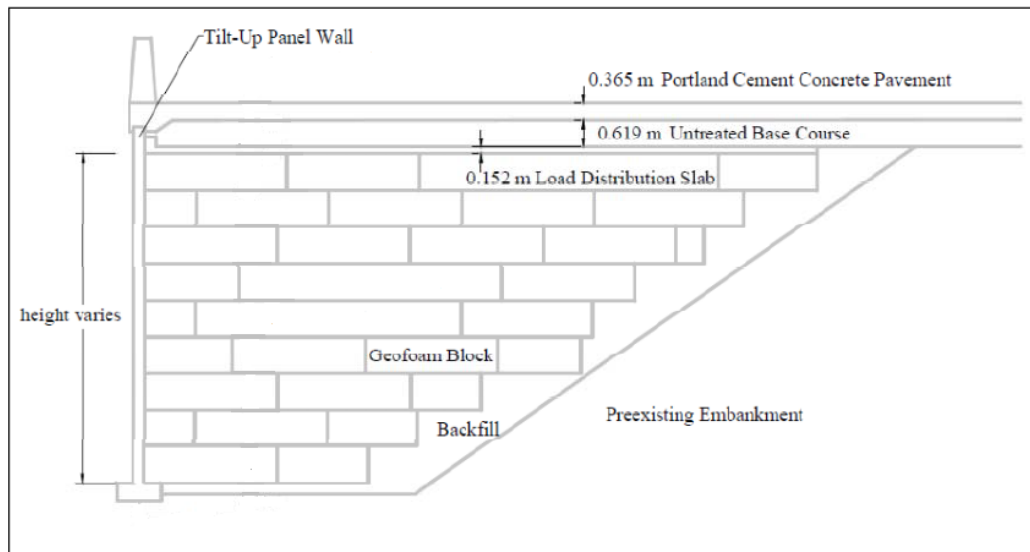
Typical Cross-Sectional View of EPS blocks for I-15 Alignment.
